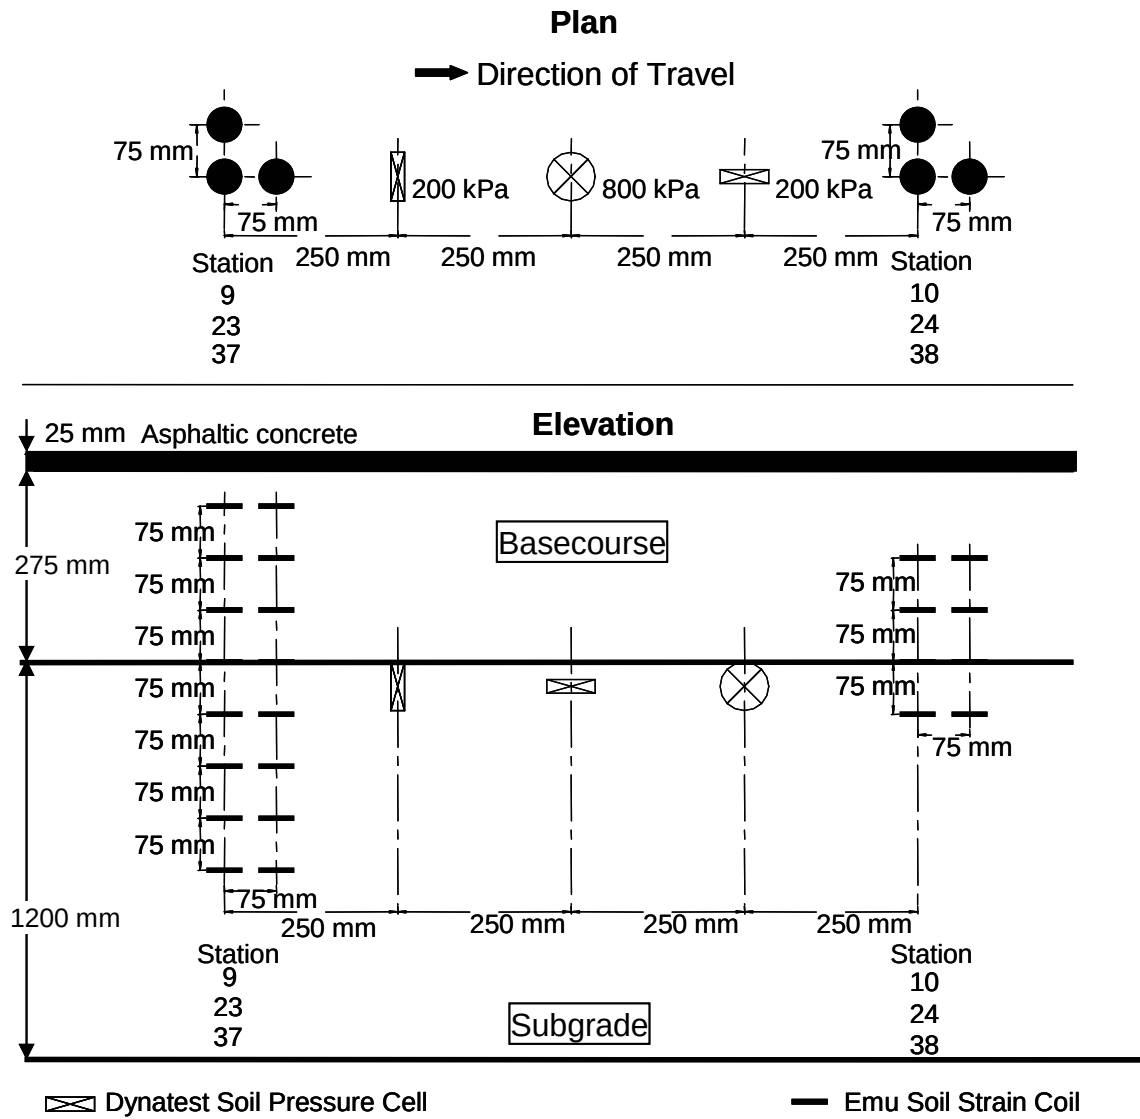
Layout of CAPTIF pavement instrumentation.
